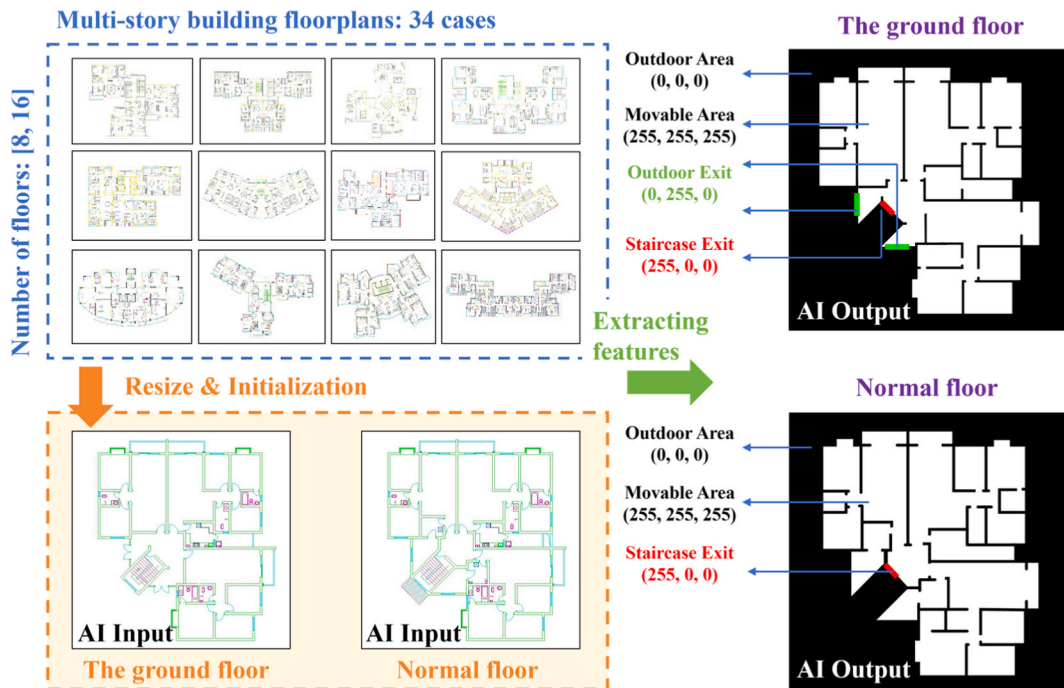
Database construction of multi-floor building floor plans for ControlNet training.
